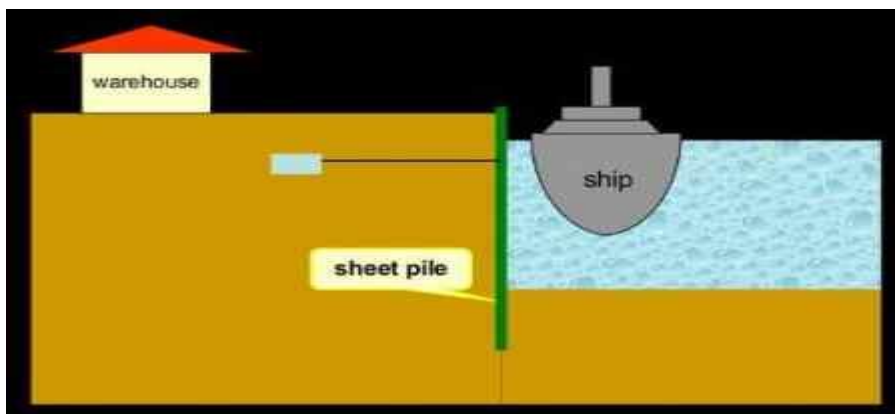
Sheet Pile Foundation to Confine the Soil Near the Water Body
